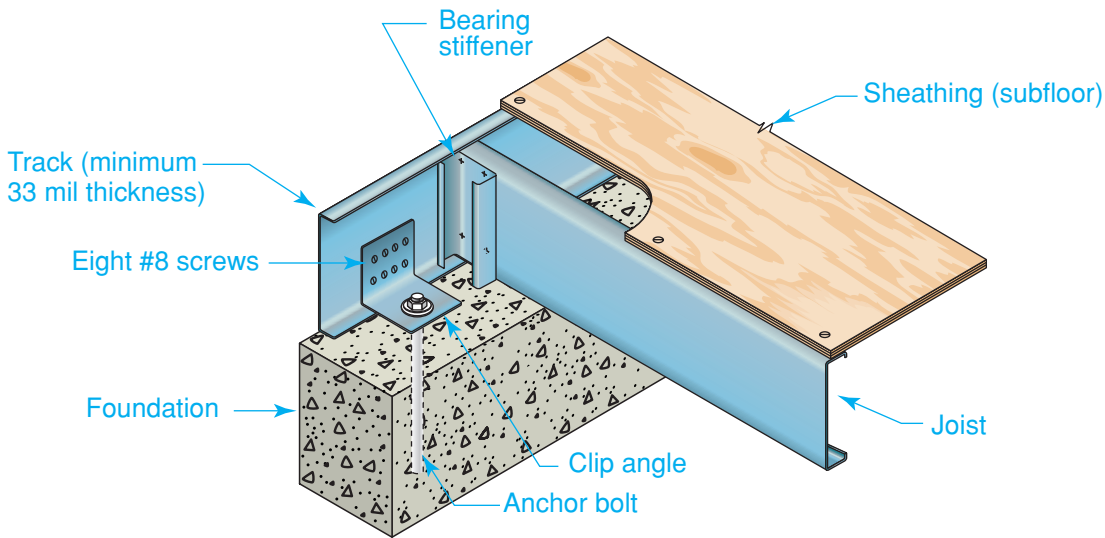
Clip Angle and Anchor Bolt Firm Foundation Track attached to foundation with clip angle and anchor bolt. The web faces the outside of the foundation wall.
